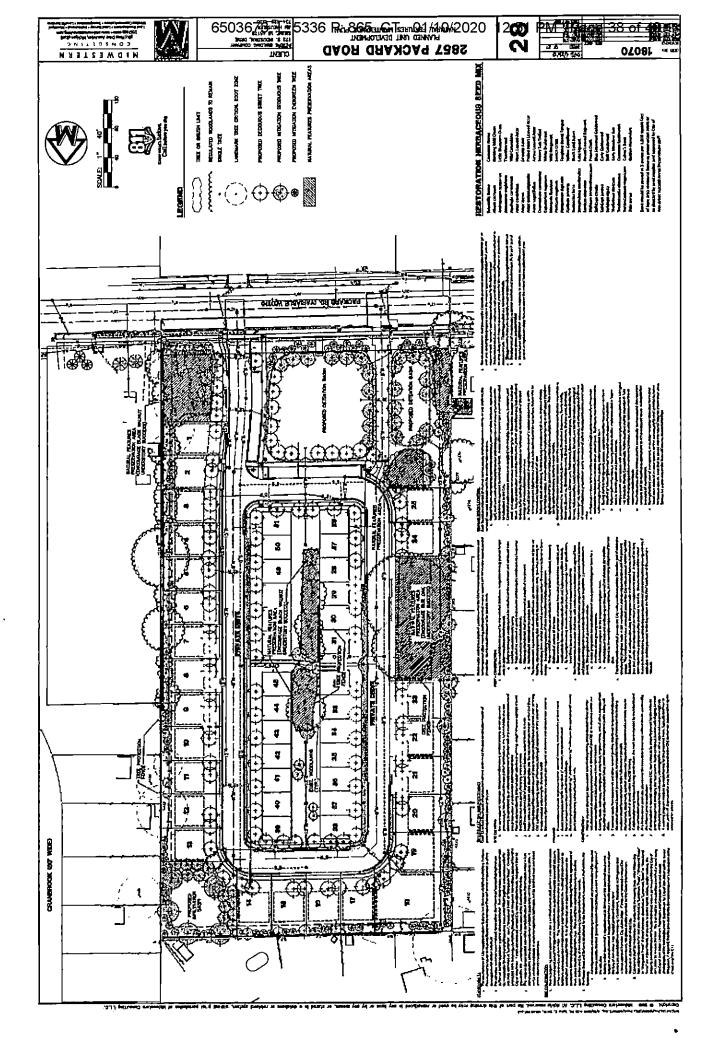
# EXHIBIT C ADDITIONAL SITE PLAN REQUIREMENTS
